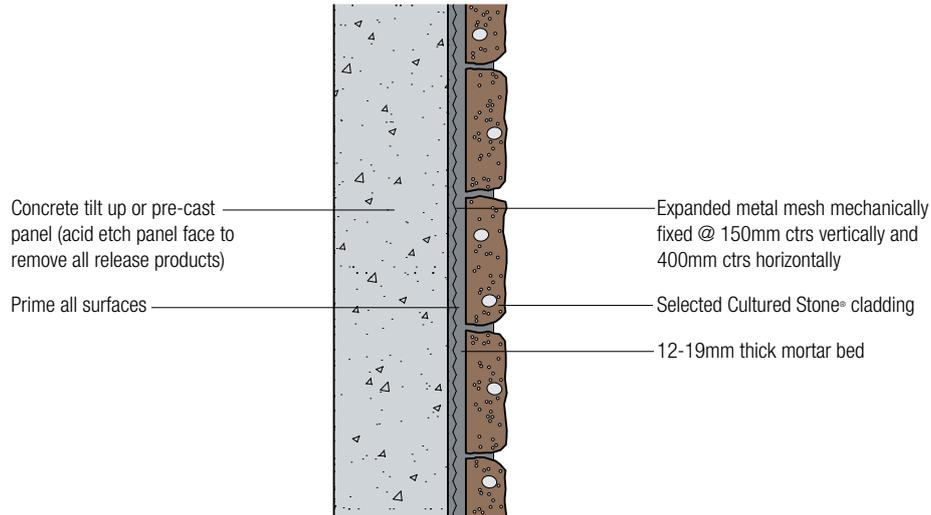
Concrete Tilt Up or Precast Panel - Section (Dwg # CS-05.04)
